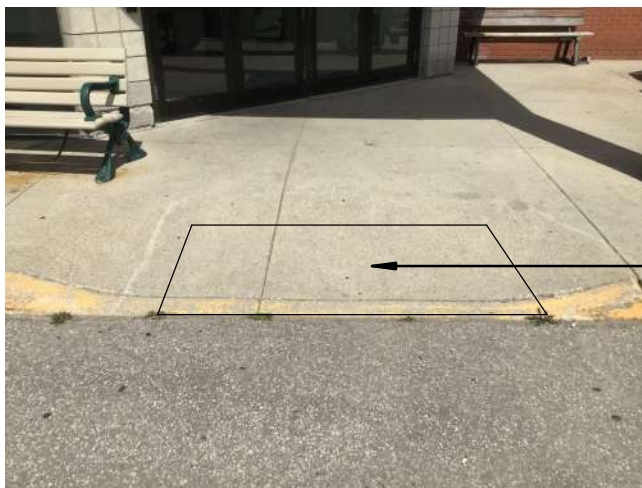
EXISTING ENTRANCE / EXIT, EXISTING CURB RAMP
